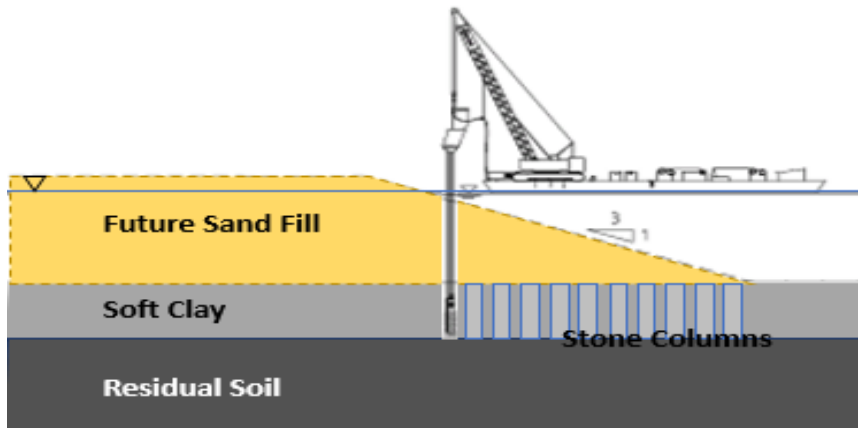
Stone column installation from a barge (modified after Leong and Raju 2007)
